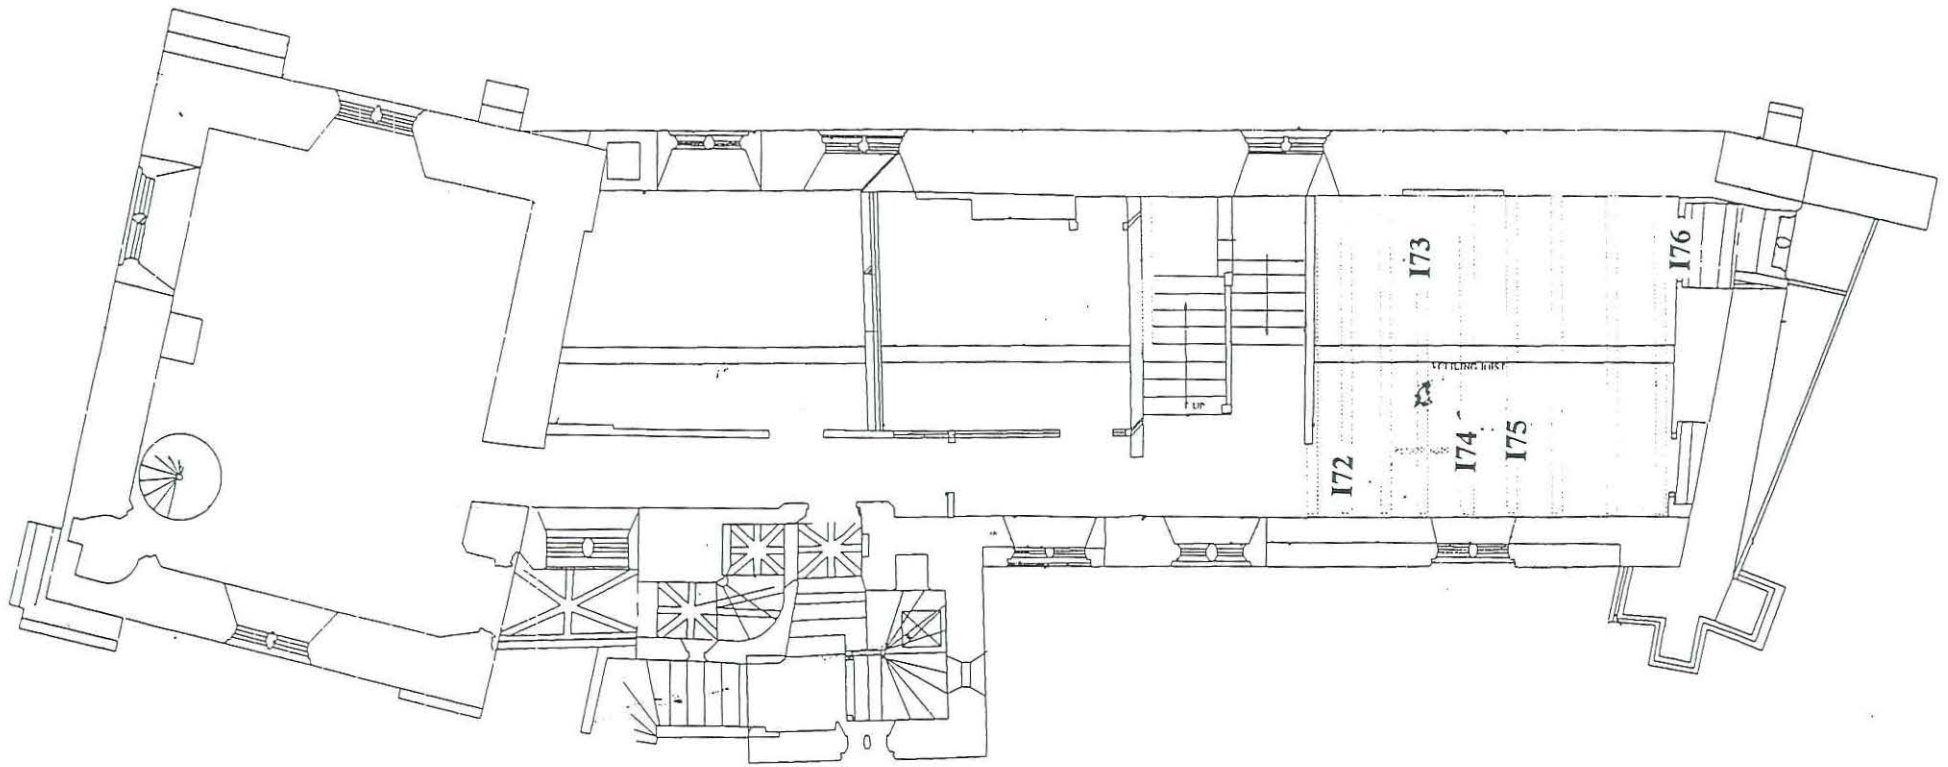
Plan of the first-floor joists of the gatehouse to show positions of samples
